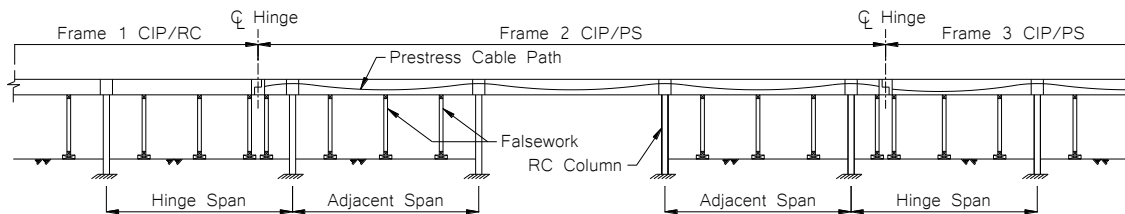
Typical longitudinal view of a Bridge with two in-span hinges
